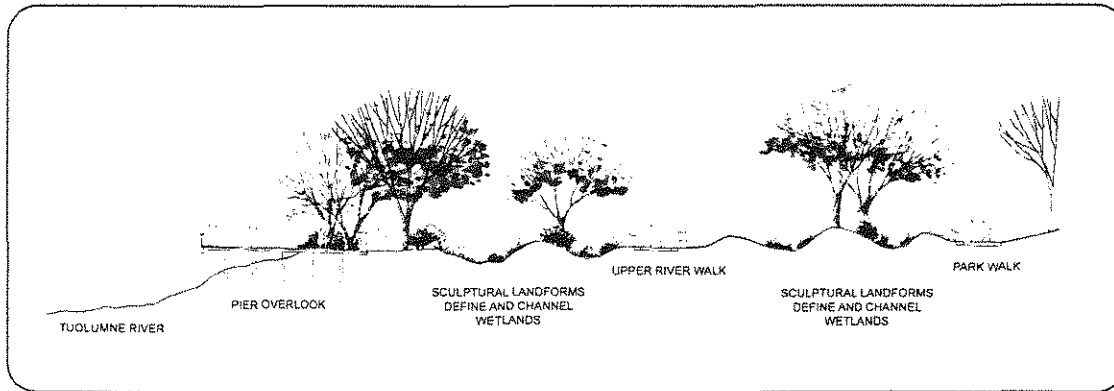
Carpenter Road Area - Illustrative Cross Section B
